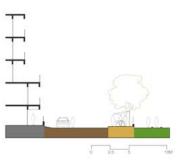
CMH Park and 9TH A Main Road: Proposed Section
